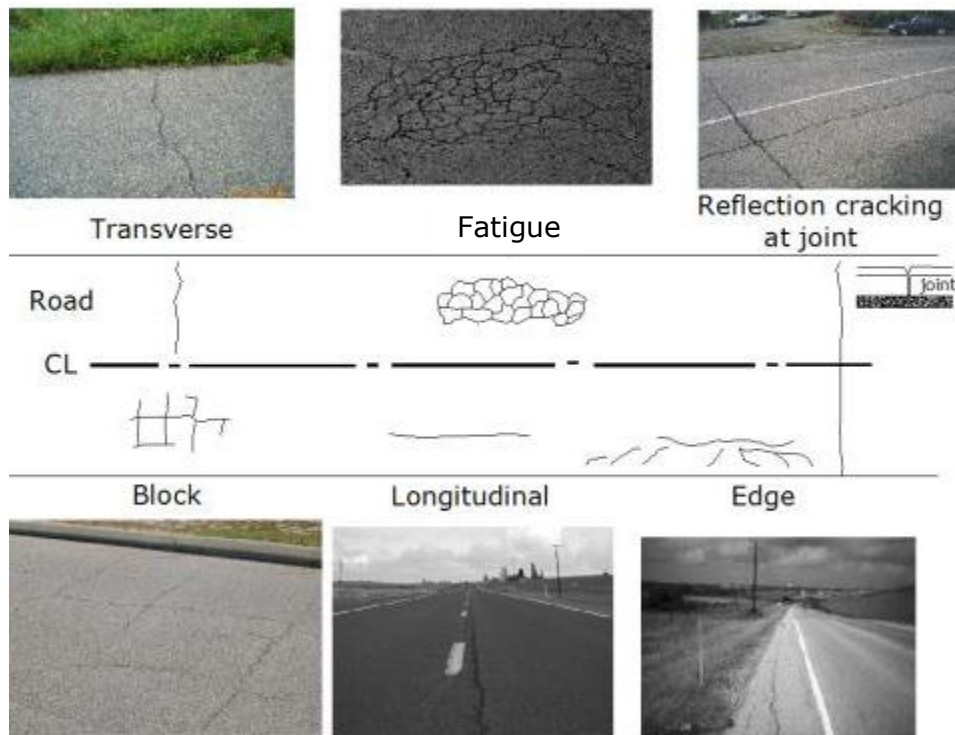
Distresses types on the asphalt road pavement, images adapted from (Asphalt Institute, 2009; Pavement Interactive, 2012)
